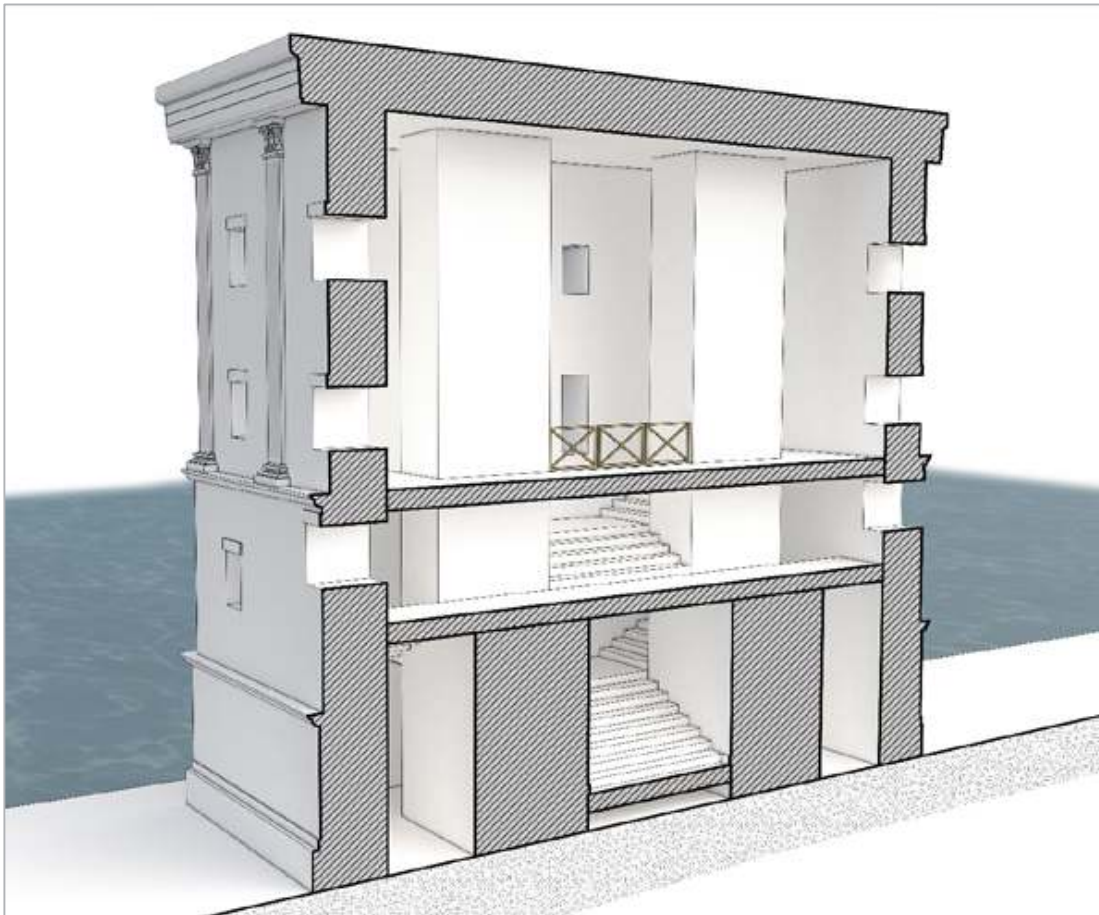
Reconstruction of the ascent proposed here: a three-story double stair-tower and a wooden bridge (illustrations: Architect Idan Rabinowitz according to the author's instructions). Cross-section 3-3, view from south-east.
